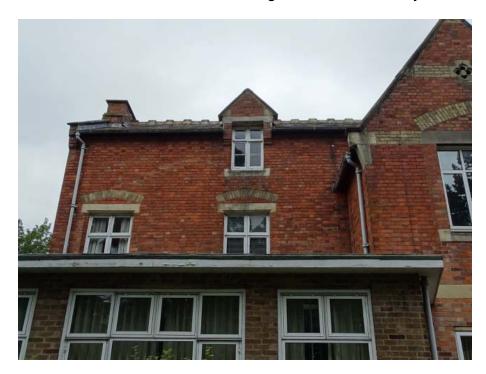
West elevation of the House at the north aspect above the 20th century extension
